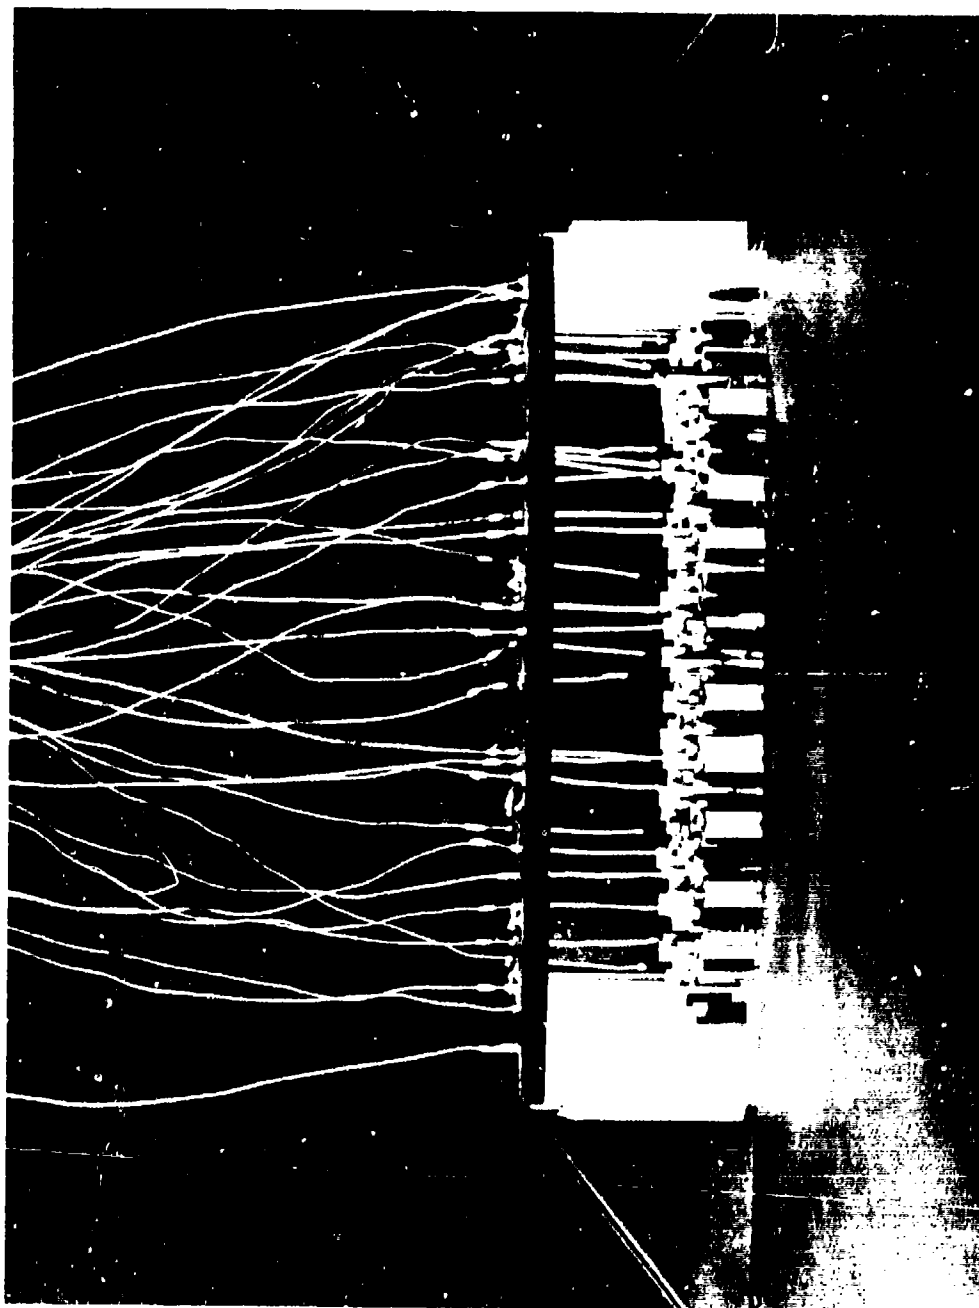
ABOVE-GROUND BERMED SHELTER MODEL WITH ONE WALL
